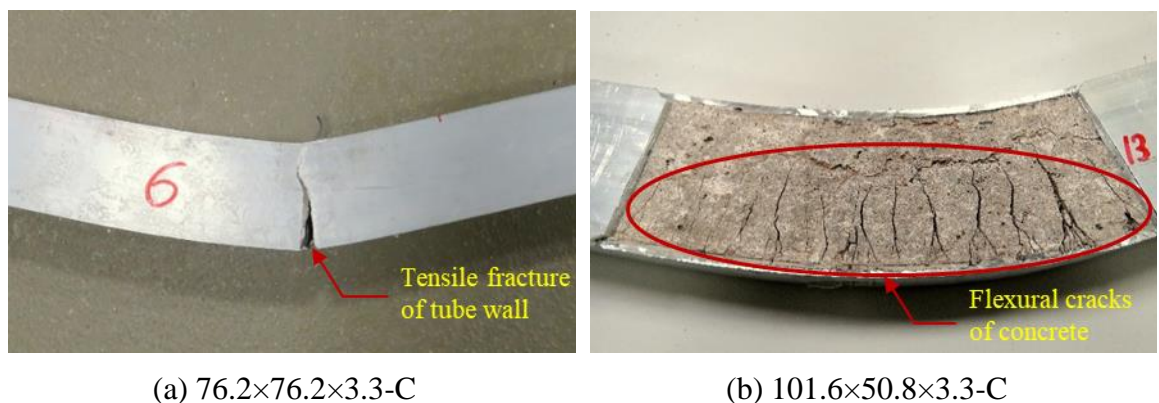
(a) Tensile fracture of tube wall, (b) Typical failure modes of concrete.
